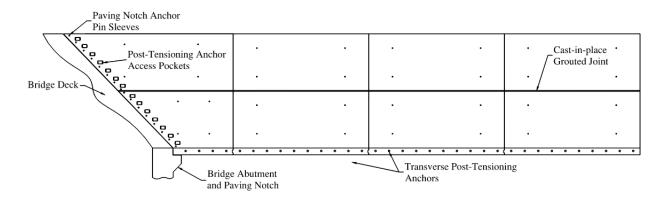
Plan view of precast post-tensioned approach slab panels (Merritt et.al, 2007)
